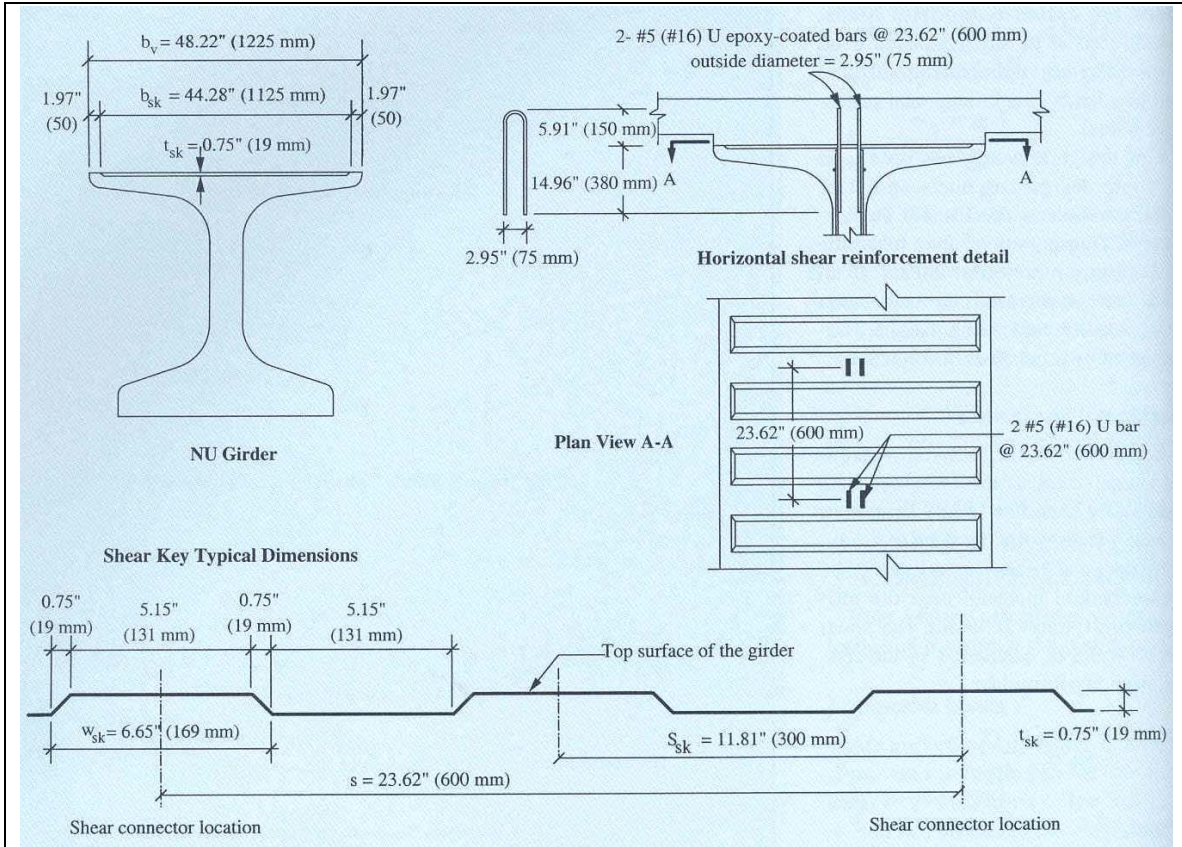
Modified debonded shear key connection system (Tadros et al., 2002)
